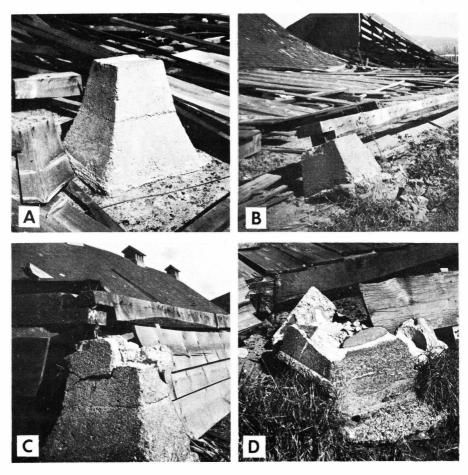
A, This well-built pier was securely doweled to its footing—but the anchor bolt to hold the sill was omitted; B, the anchor bolt was supplied for the sill—but the footing was made in a shallow, round hole; C, the anchor bolt did not extend into the pier far enough and, when under strain, broke out of the pier; D, the concrete for this pier was made with aggregate that was too large for the size of the pier.
